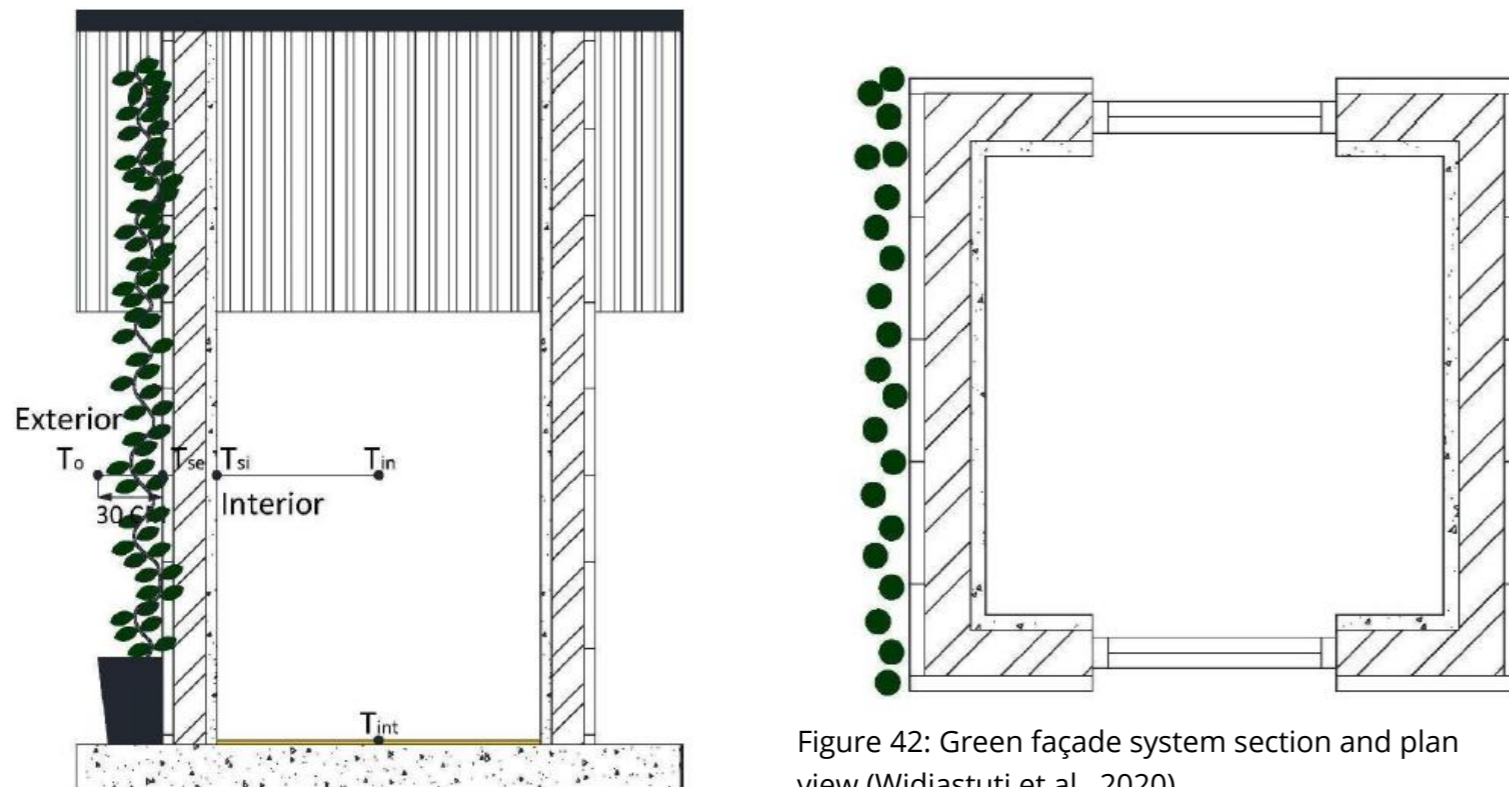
Green façade system section and plan view (Widiastuti et al., 2020).
